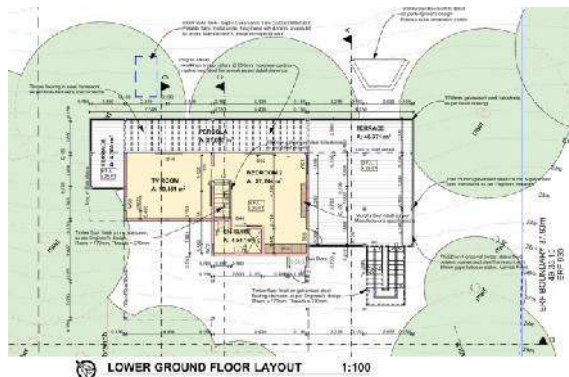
Ground floor layout plan (DEM TECH, 2020)
